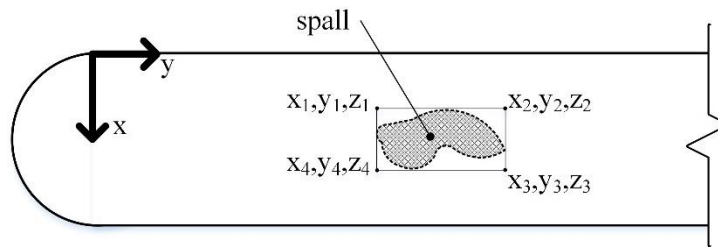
Illustration. Location of local element origin and defect coordinates on pier cap with rounded end— plan view.
